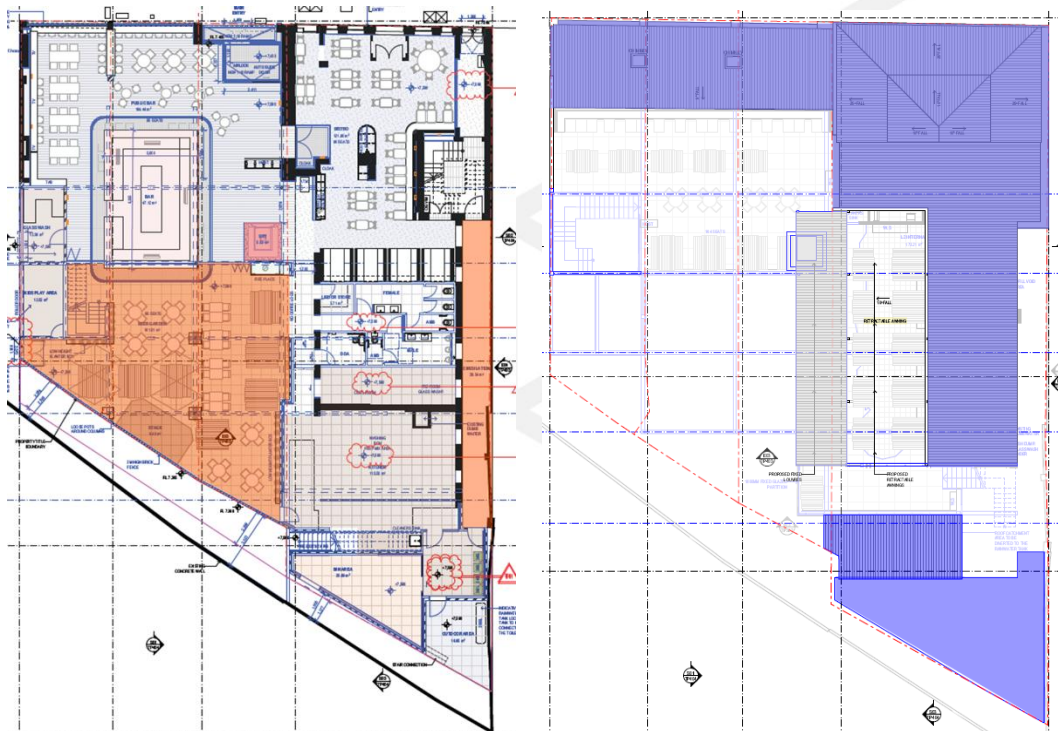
Roof catchment area to RWT (blue). Beer/garden and circulation area paving to be designed as permeable (orange)
